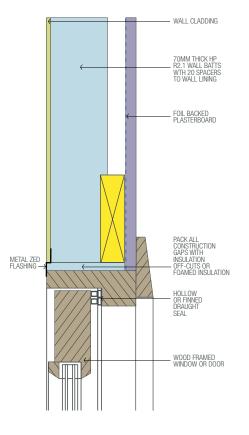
Air Bridge. Shrinkage or workmanship creates gaps around parts of the insulation.
